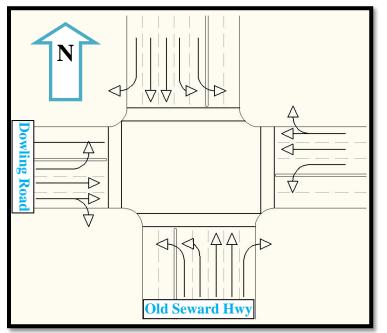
Selected Alternative Geometry at Dowling Road and Old Seward Highway
